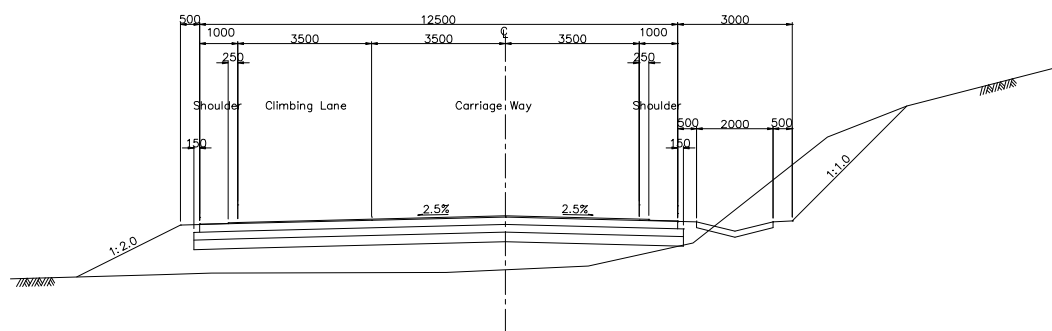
Proposed Cross Section for Climbing Sections
